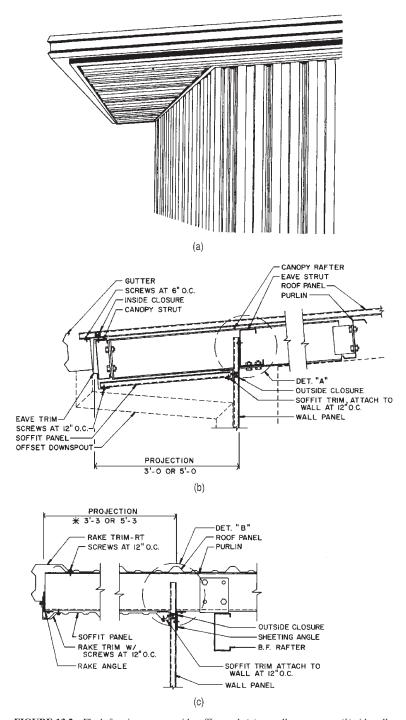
Flush-framing canopy with soffit panel: (*a*) overall appearance; (*b*) sidewall section; (*c*) endwall section. (*Metallic Building Systems*.)
